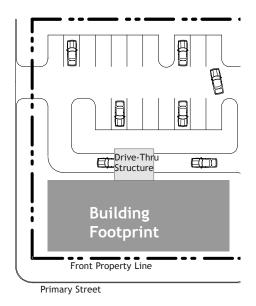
(6) Recommended Drive-Through Facility Layout
